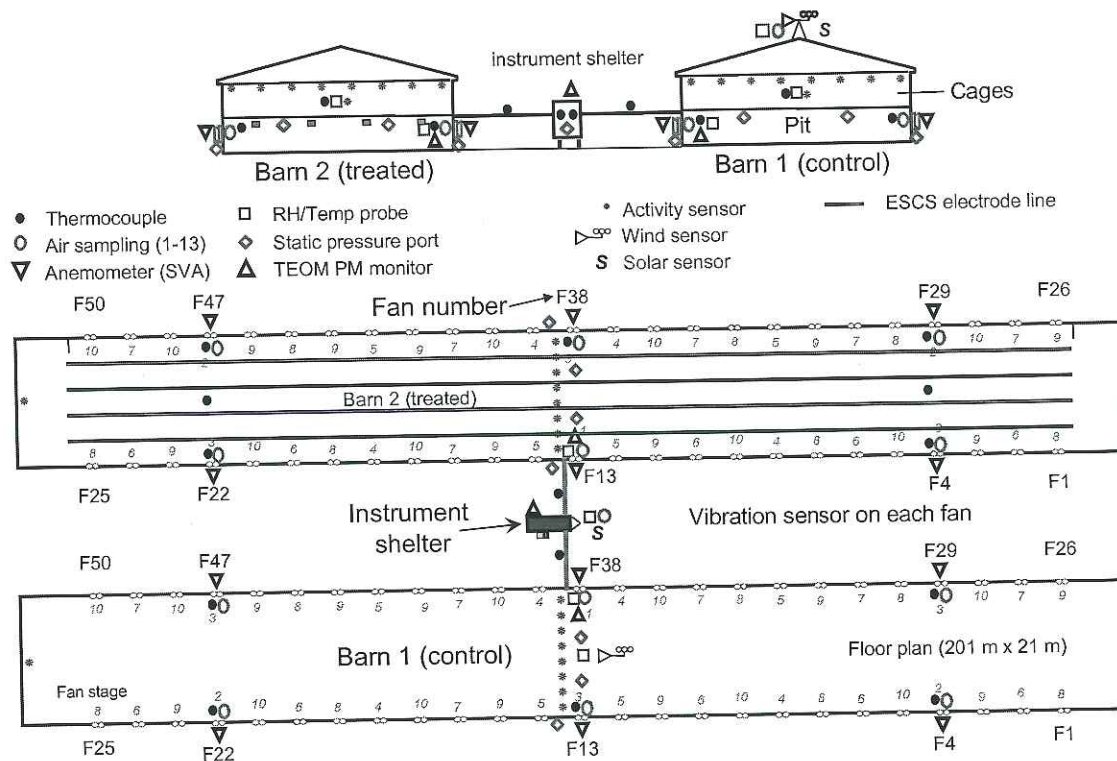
Layout and Cross-Section of High-Rise Layer Barns Showing Monitoring Locations.
